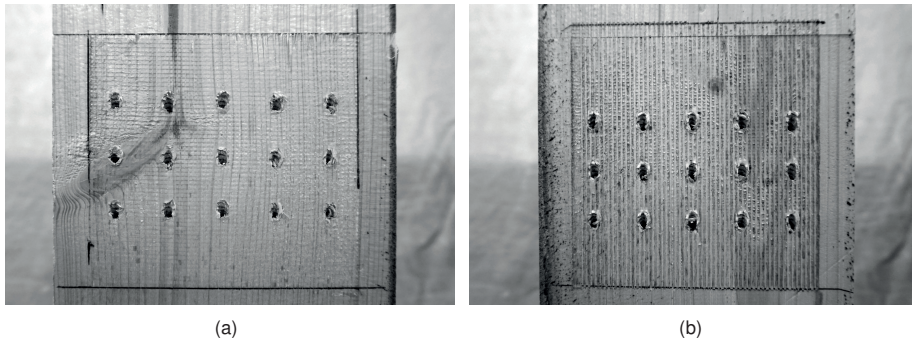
Modified surfaces after tests: (a) embossed inverse pyramid pattern; (b) milled pyramid pattern.
